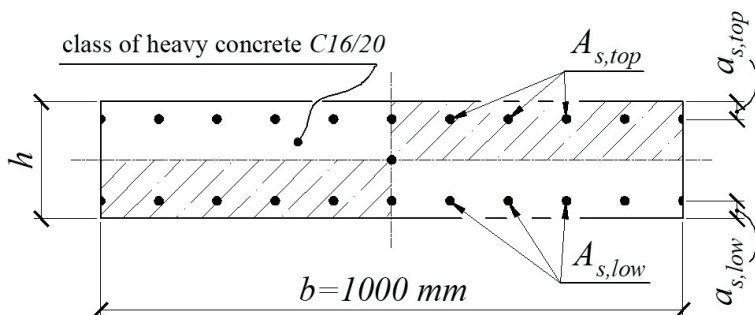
Geometric dimensions and normal section reinforcement scheme of reinforced concrete slab
